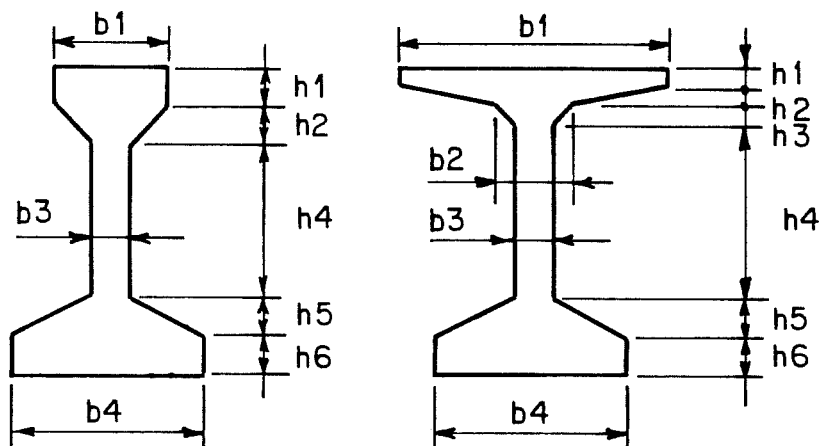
Key to cross section dimensions given in Table 2.1
